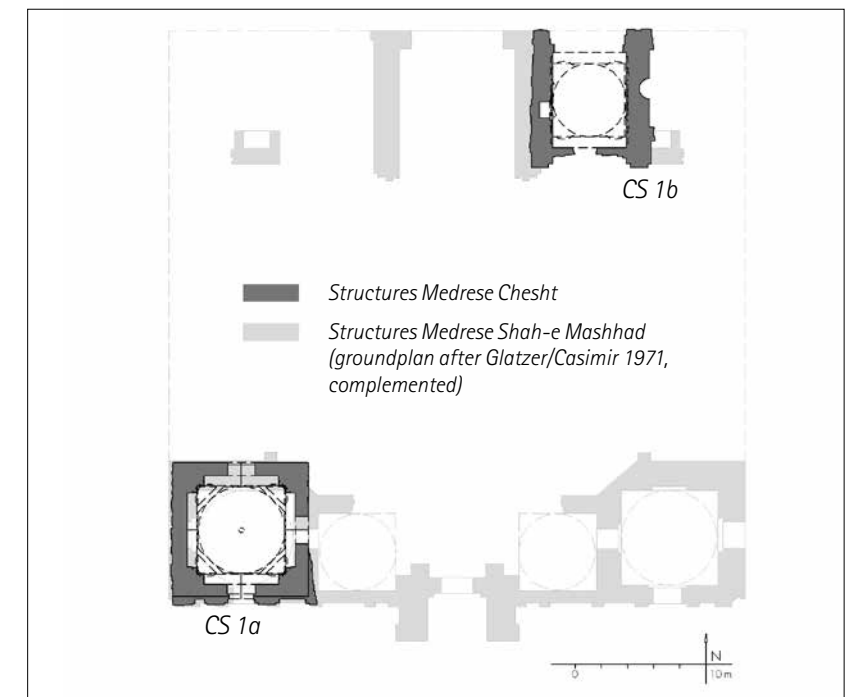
Projection of the Chesht buildings onto the Shah-e Mashhad groundplan
